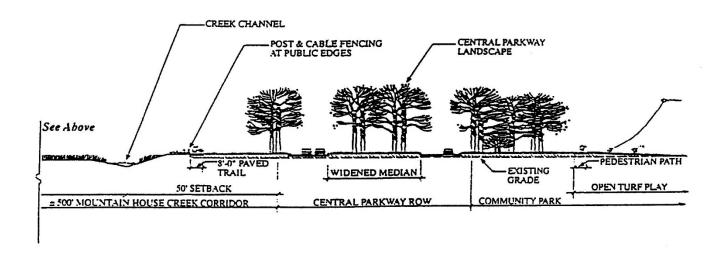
MOUNTAIN HOUSE CREEK AT TOWN CENTER
